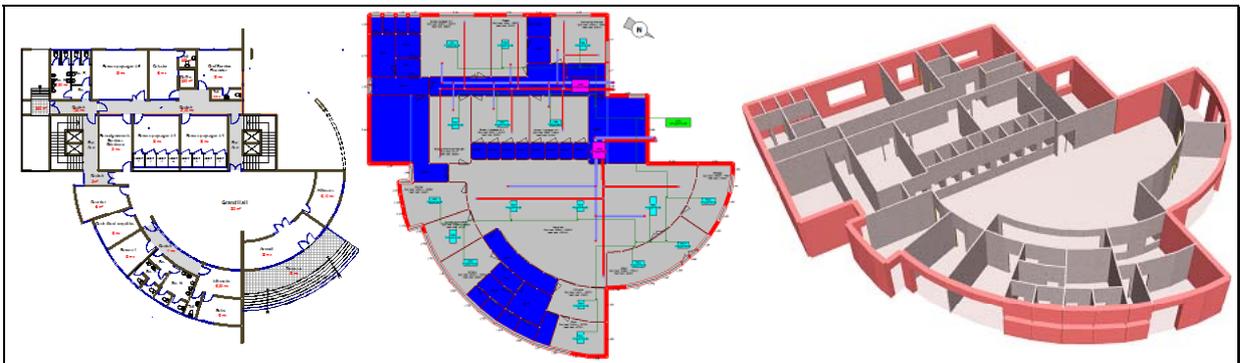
Designing ventilation and air conditioning, starting from an AutoCAD drawing
